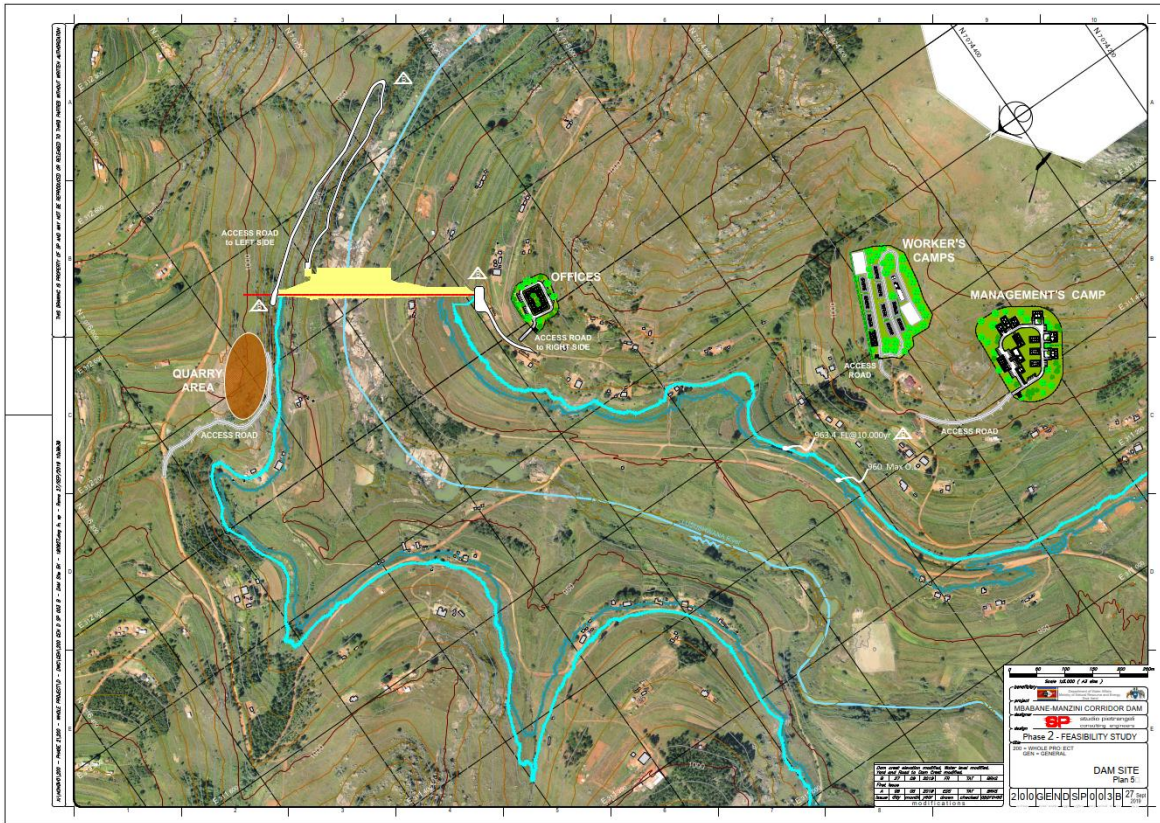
Layout showing the location and extent of the dam wall and associated infrastructure (quarry, site camps and offices, access roads)
